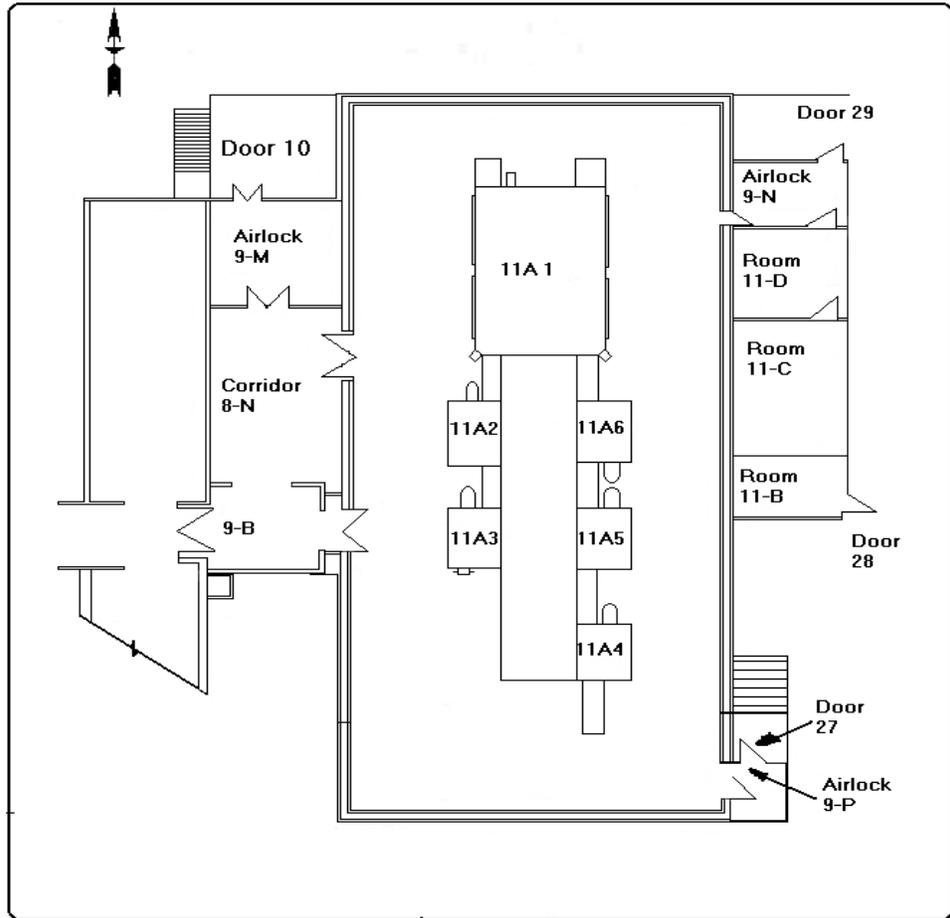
222-S LABORATORY LAYOUT OF THE SECOND FLOOR.
